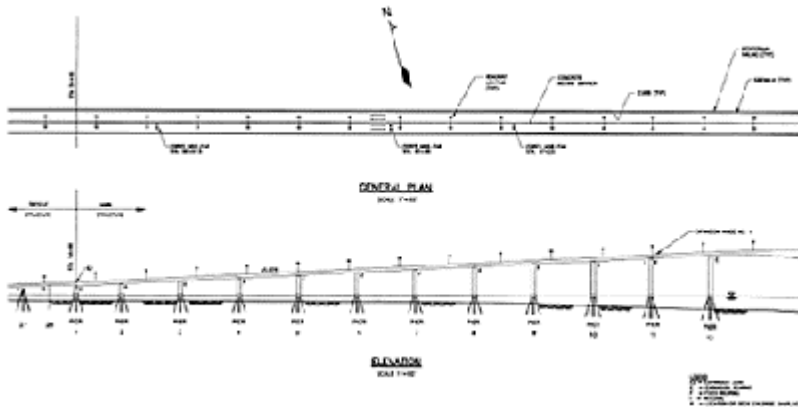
General Plan and Elevation, Main Structure, West Approach Spans.
